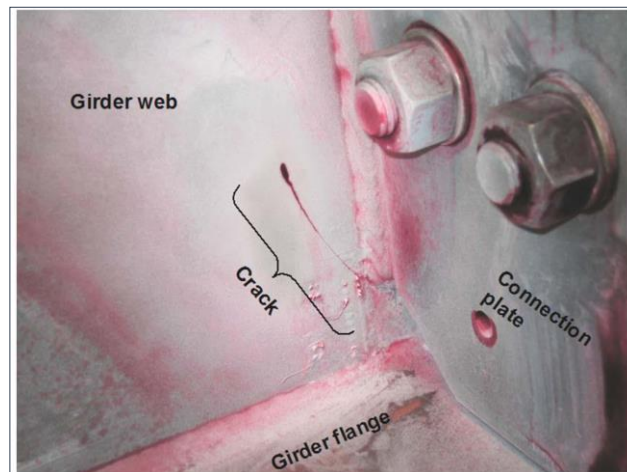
A crack was detected in a steel girder using red dye penetrant [5].
